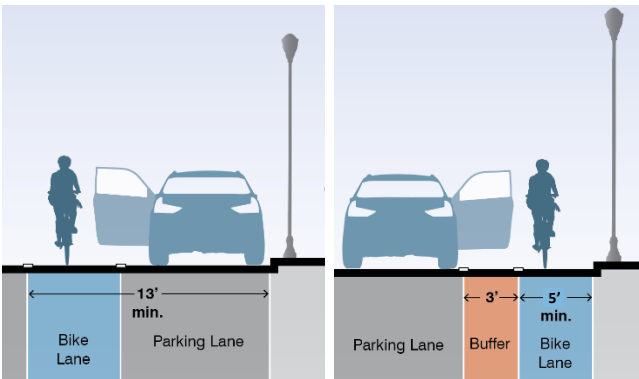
Bike Lanes and Parallel On-Street Parking
